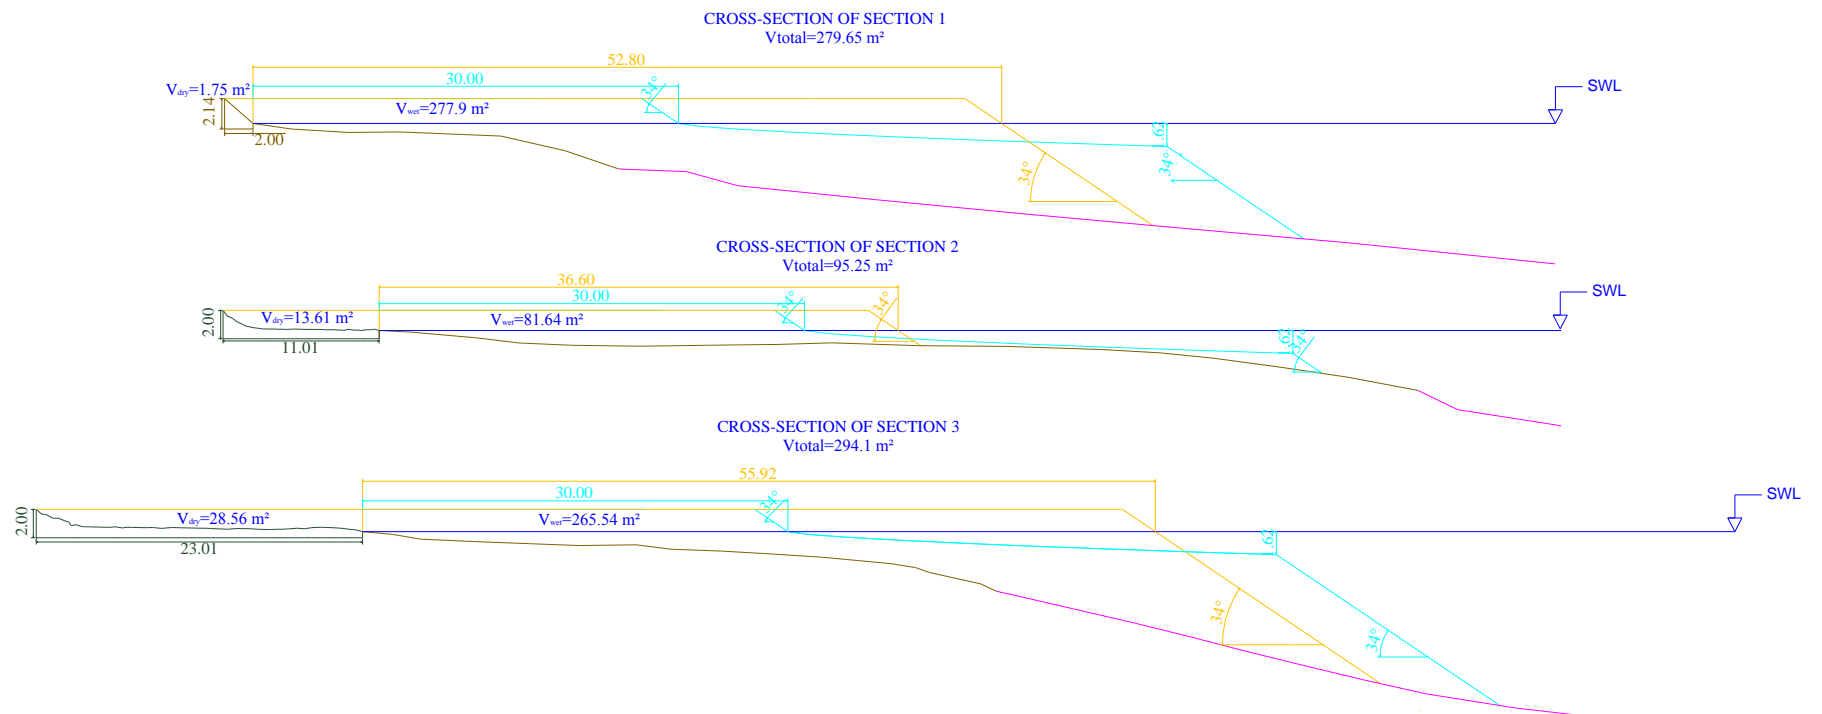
Design profiles of Section 1,2 and 3 for 30 m new dry beach width ($D_{fill} = 0.45 \text{ mm}$).
